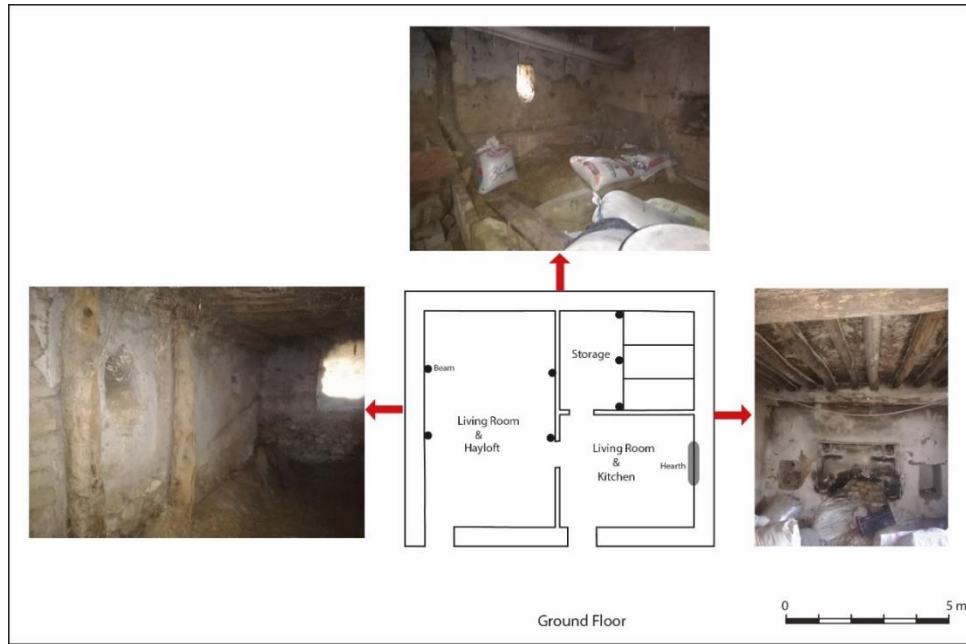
Mehmet Aydın's House Ground Floor (Photo and Illustrated by M. Çarkı)
